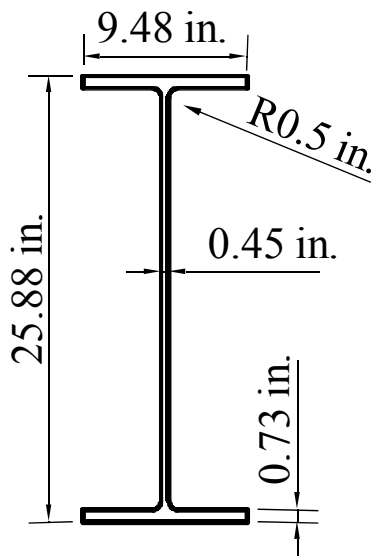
Cross-section dimensions of W26x85 bridge girder
